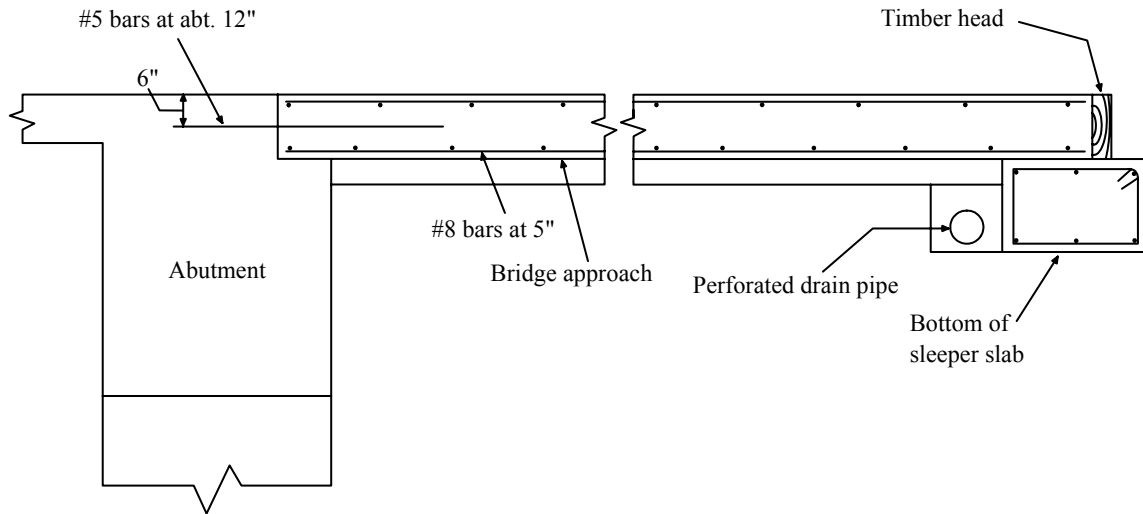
Bridge approach connected to bridge deck (Missouri DOT 2003)
